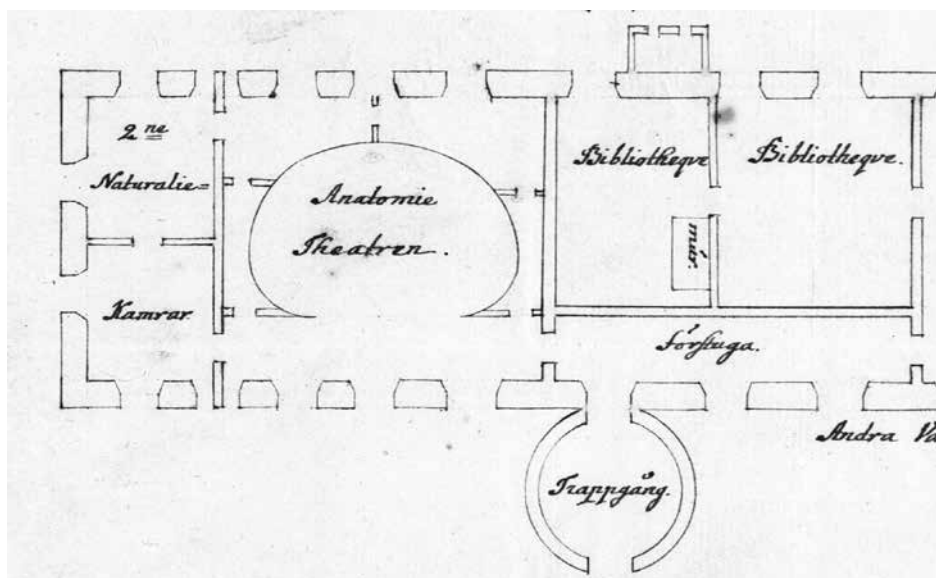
Floor plan from 1745. Riksarkivet, Stockholm.
